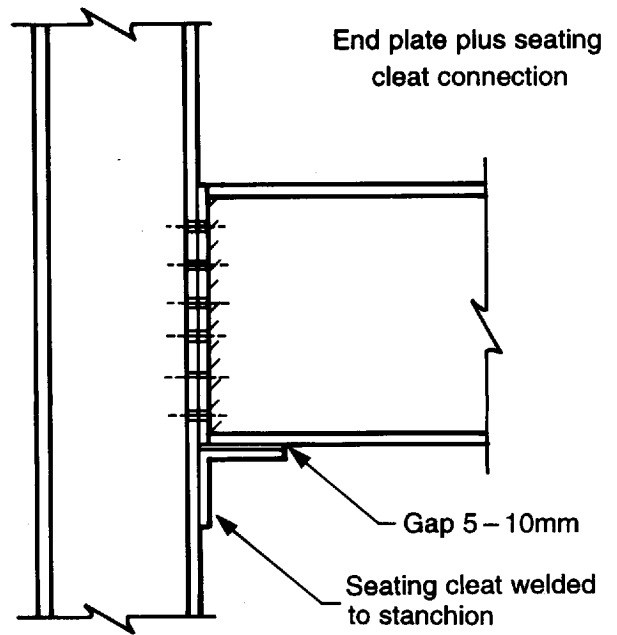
Bolted stanchion to beam connection with welded seating
